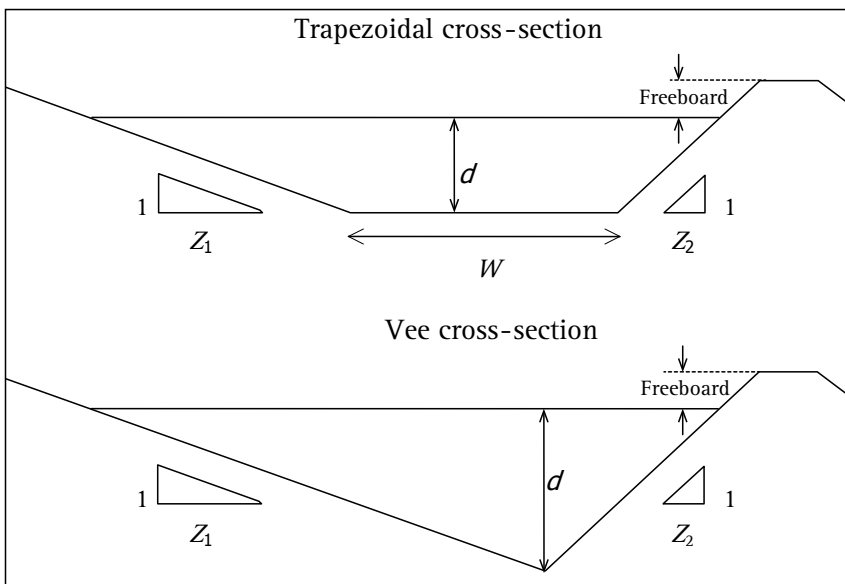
Typical profiles of feedlot drains (trapezoidal and V-drain)
